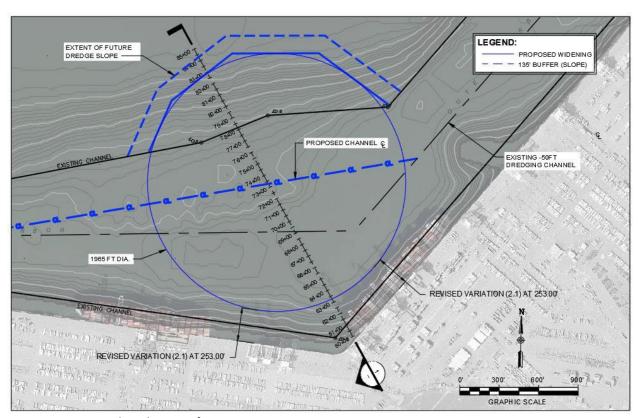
Outer Harbor Plan View for Cross Sections, Stationing
